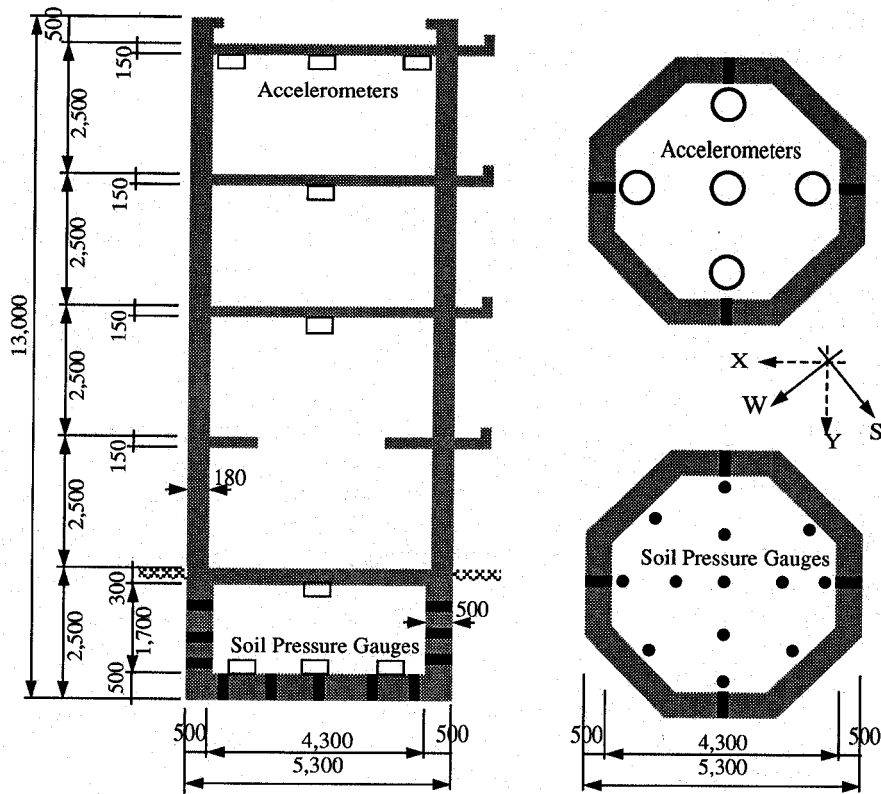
Vertical and horizontal cross-sections of the tower (dimensions in mm)
